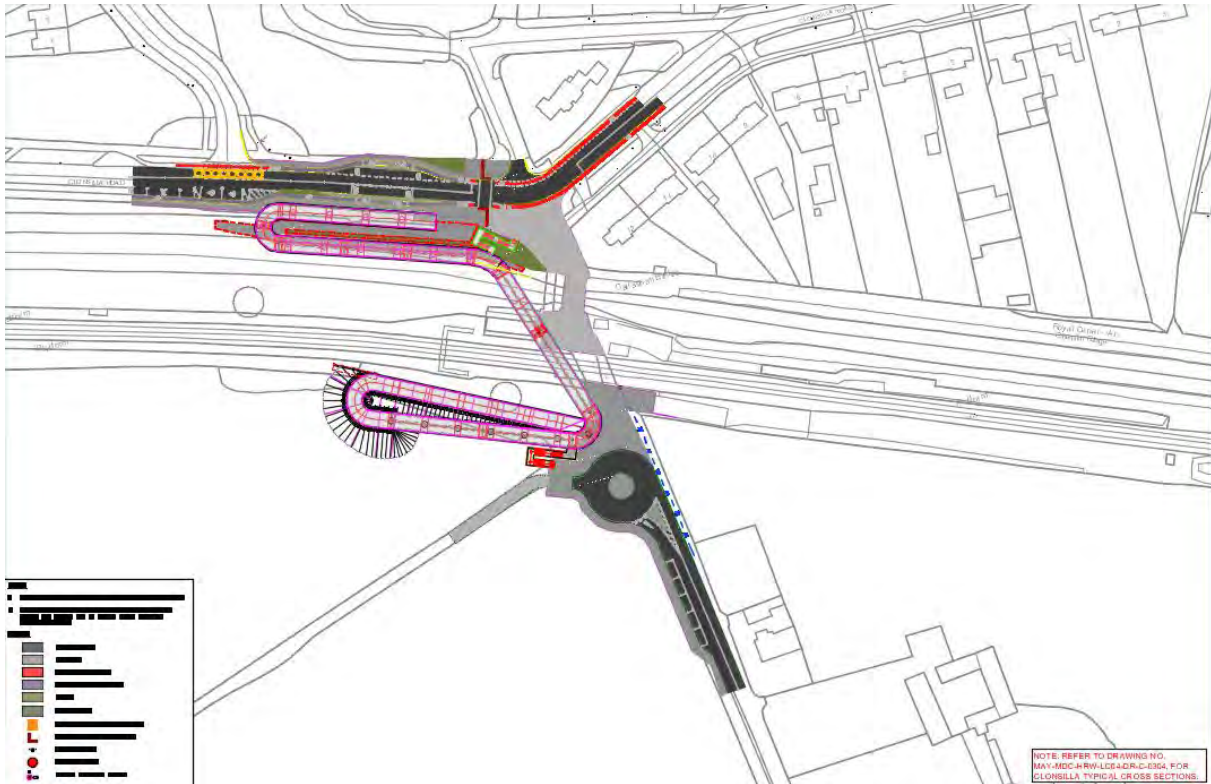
Plan of proposed works at Clonsilla level crossing
